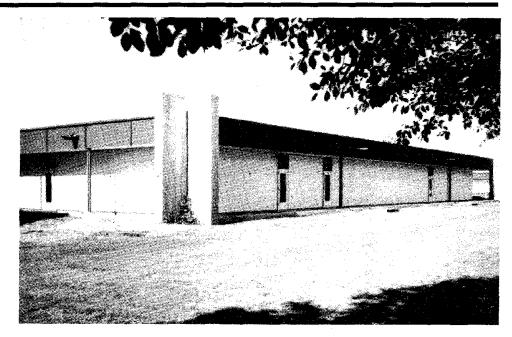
External buttresses handle all lateral forces. Oak Grove High School, San Jose, California. Allan Walter, architect.
